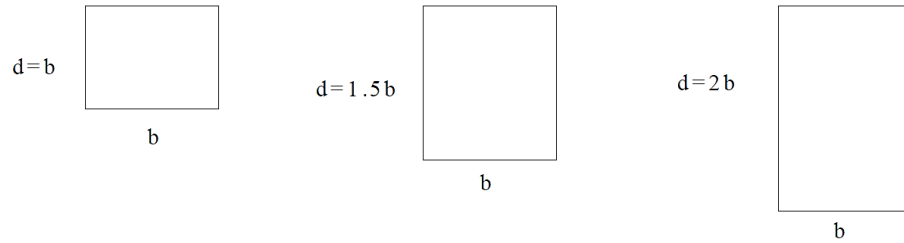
Relation between dimension of reinforced concrete beams and columns.
